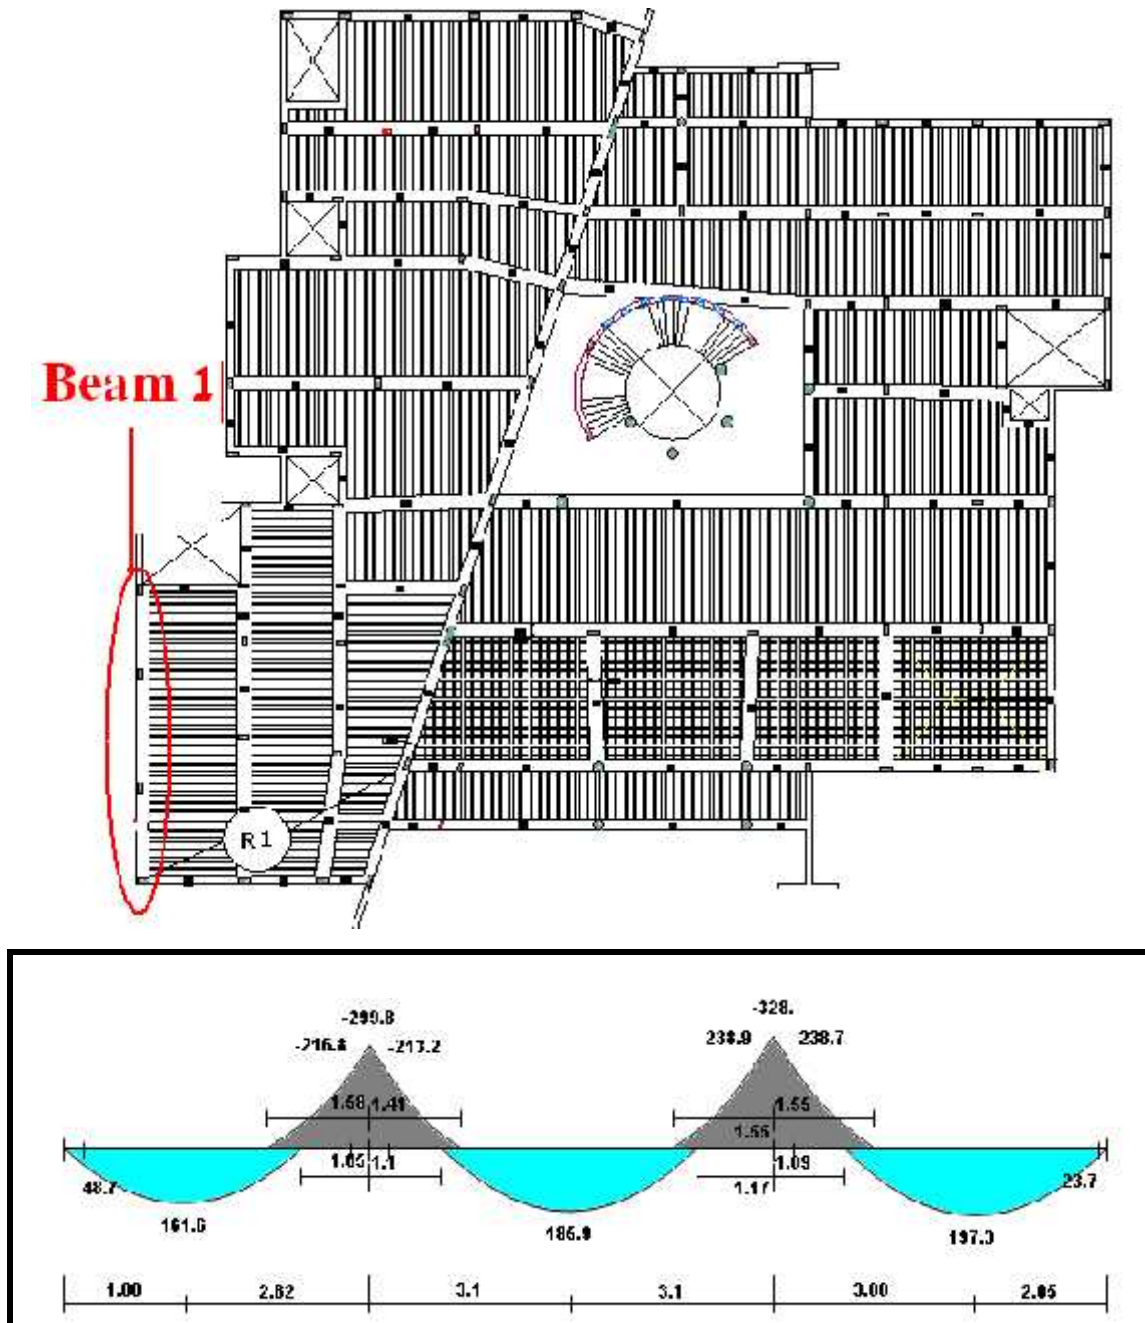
8) Moment diagram for Beam (1 )-(KN.m).
